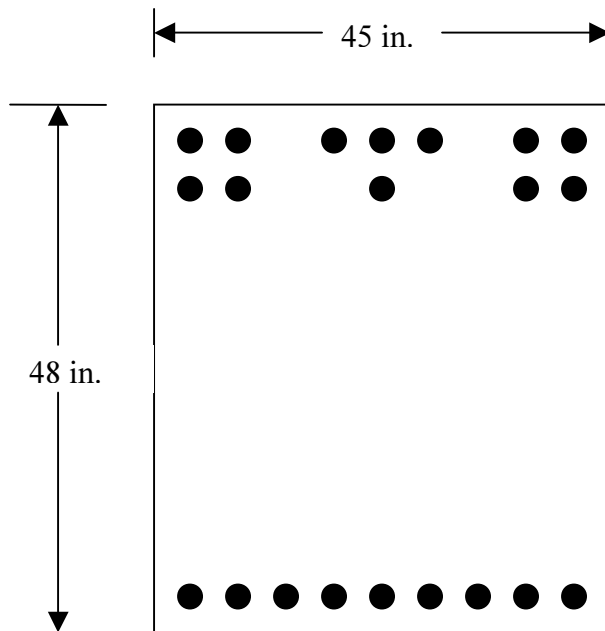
The simplified cross section of the East Bound bridge pier cap beam.
